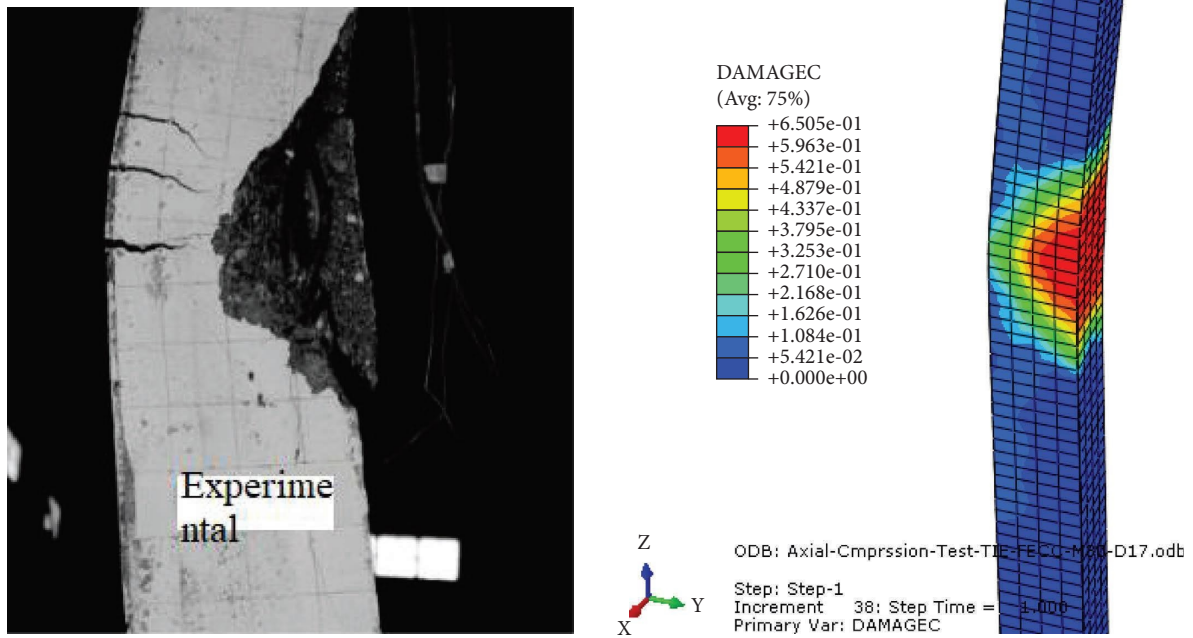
Concrete spalling and tensile cracking of experimental and numerical column of [4].
